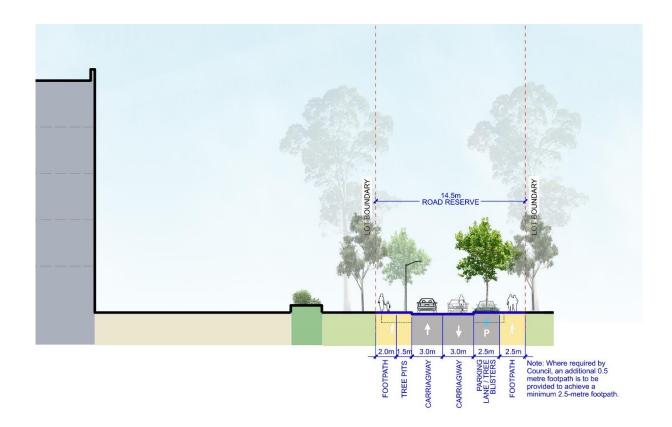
Proposed 14.5m Local Street Typical Cross-Section
